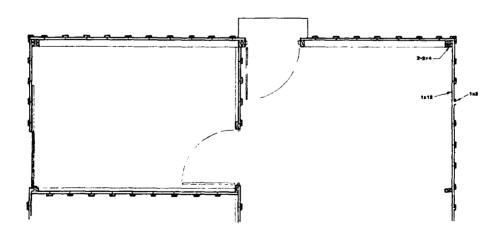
Series 600 Northern and Southern Construction: Typical Details, 1918. (Source: Manual of the Construction Division of the Army [1918].)
